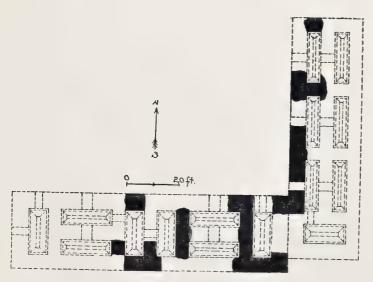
Tikal: Plan of Structures 44 and 47.
